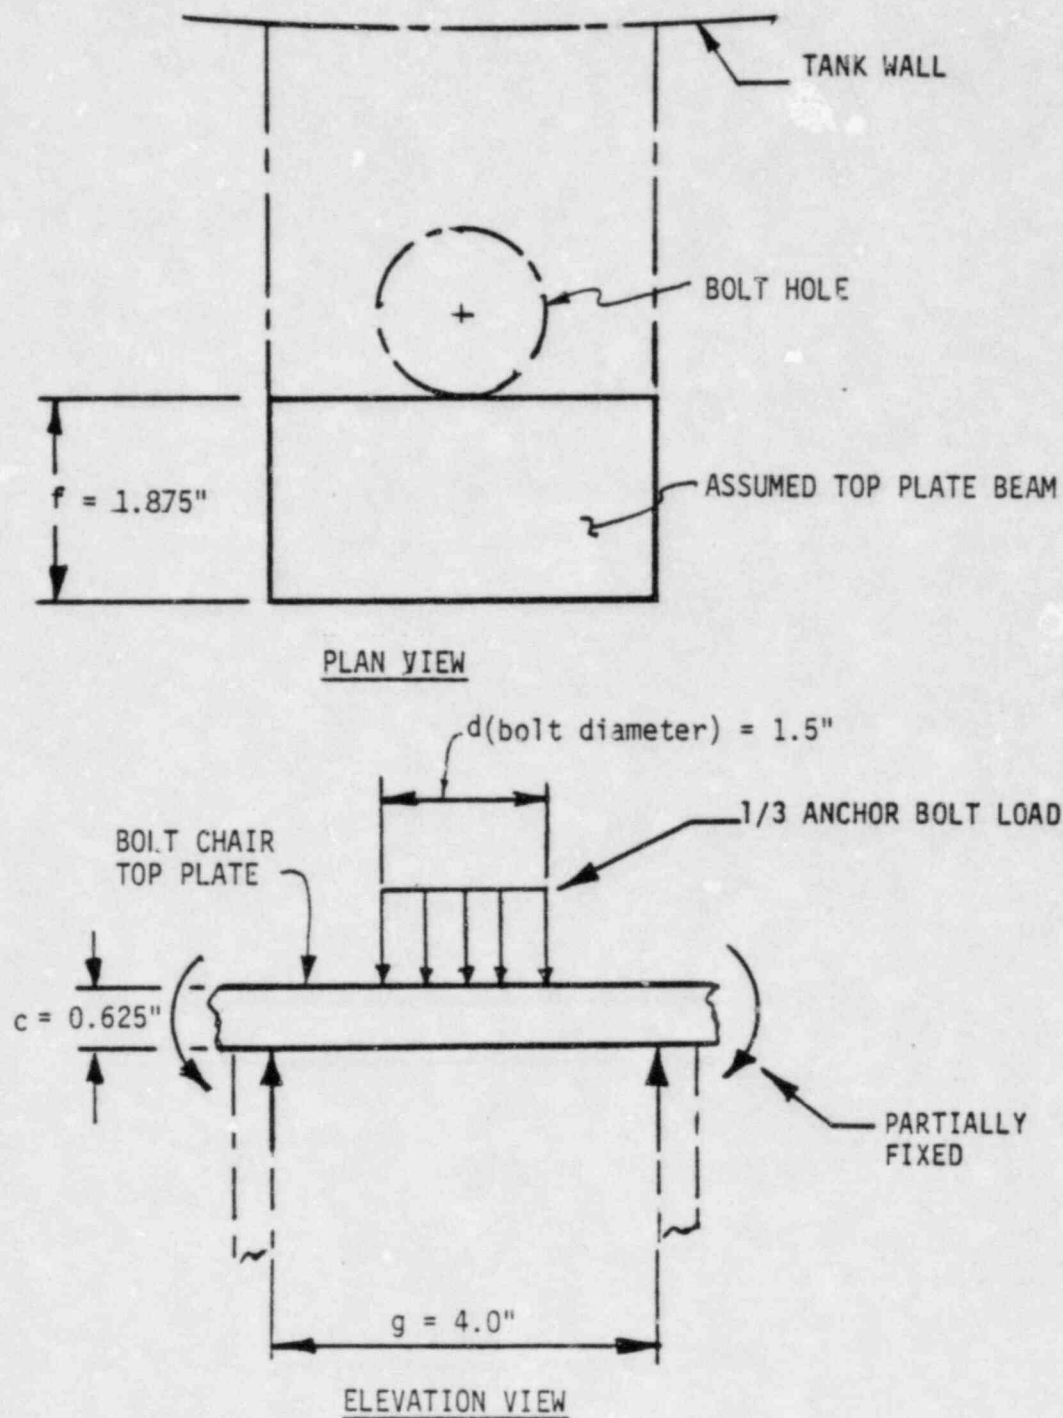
BEAM MODEL FOR BOLT CHAIR DESIGN
